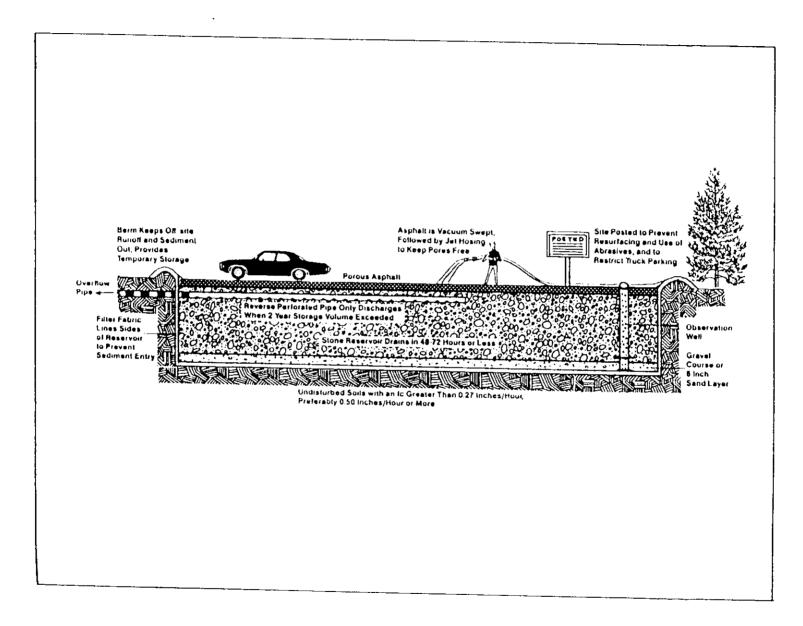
Design Schematic for Porous Pavement (Source: Schueler 1987)
